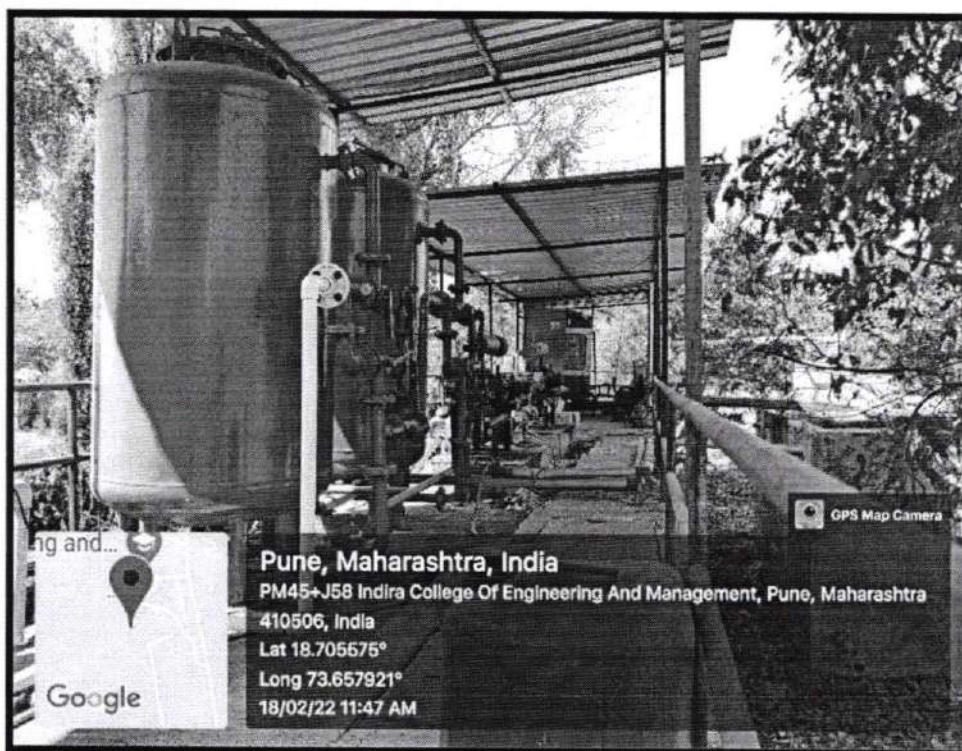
Pressure Sand Filter and other units of Waste Water Treatment Plant
